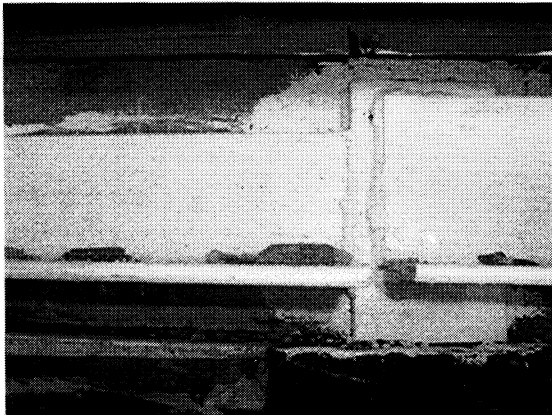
Relieving angle welded to edge of shim plate.
